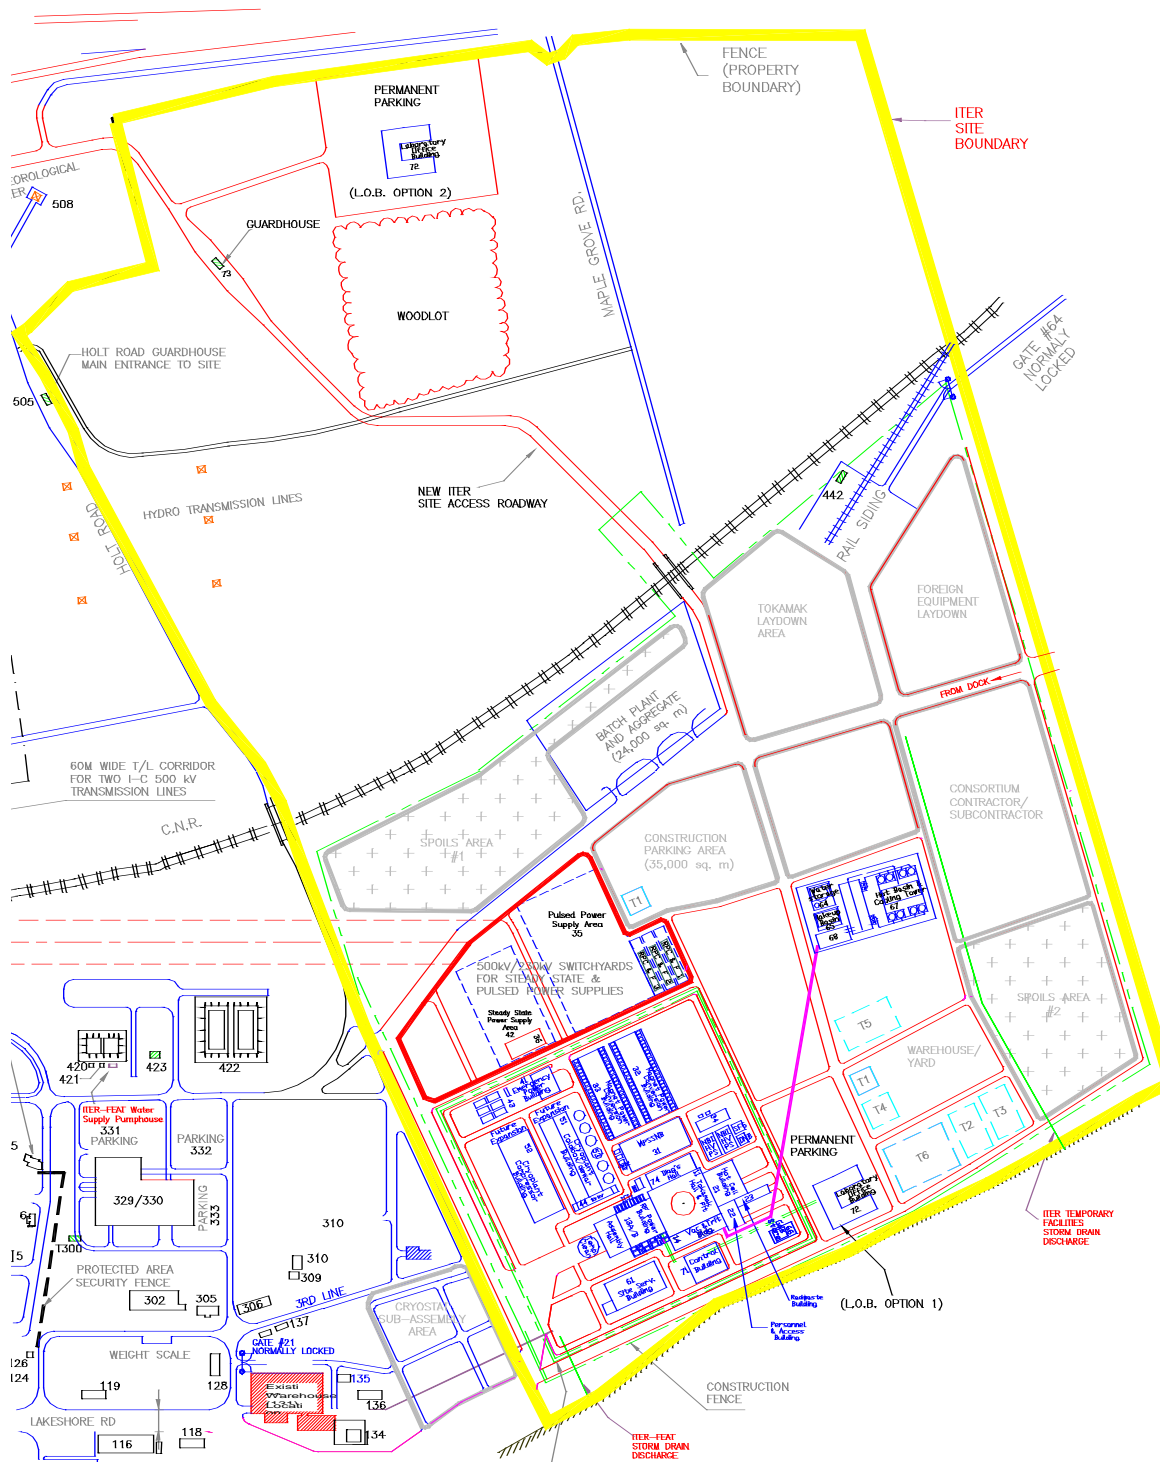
Iter Facility Building Layout at the Clarington Site
